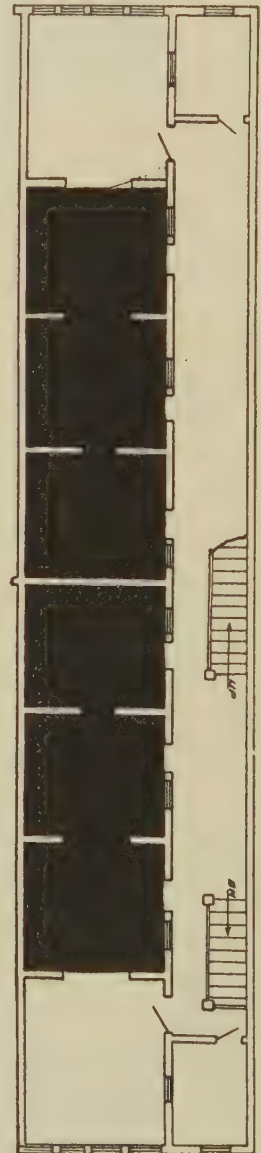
THREE OUT OF FIVE ROOMS DARK. Not even "through" ventilation possible.
